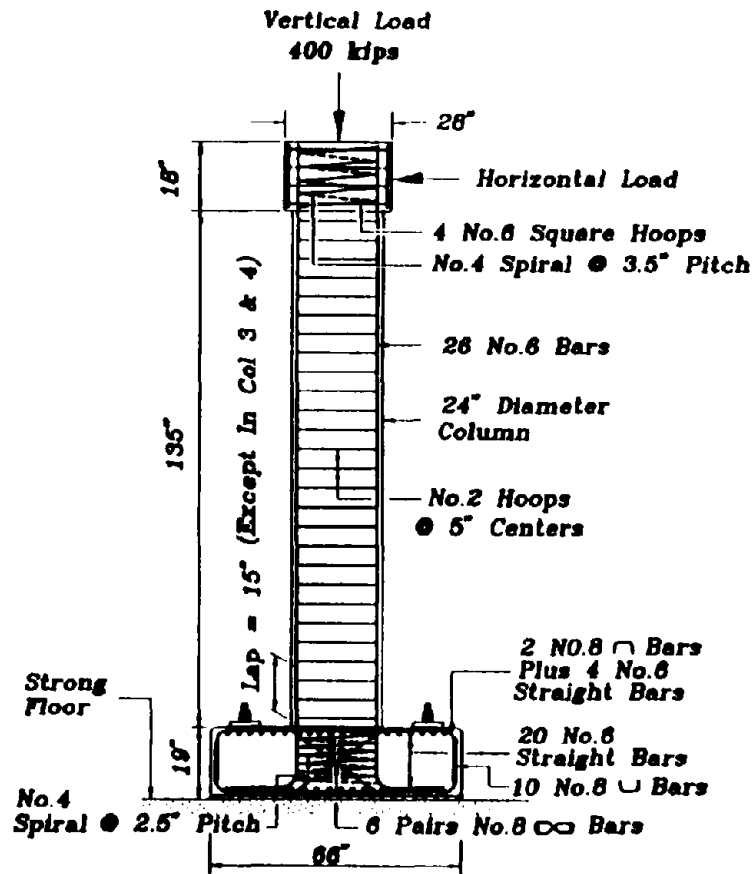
Typical Reinforcement Details for Circular Flexural Columns
